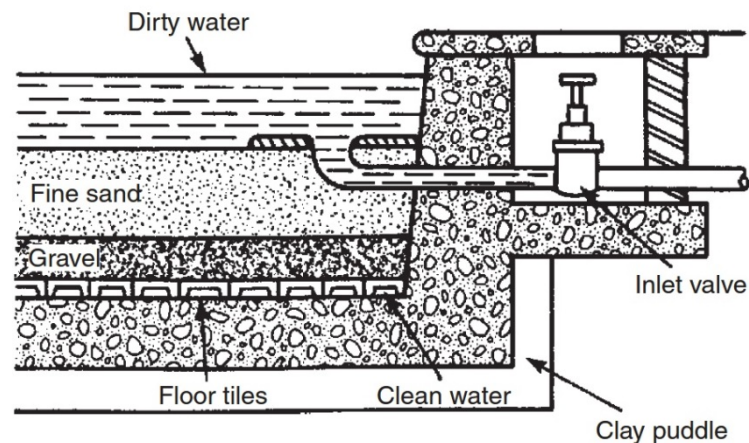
Section of Sand Filter(Source: Hall, 2011)
